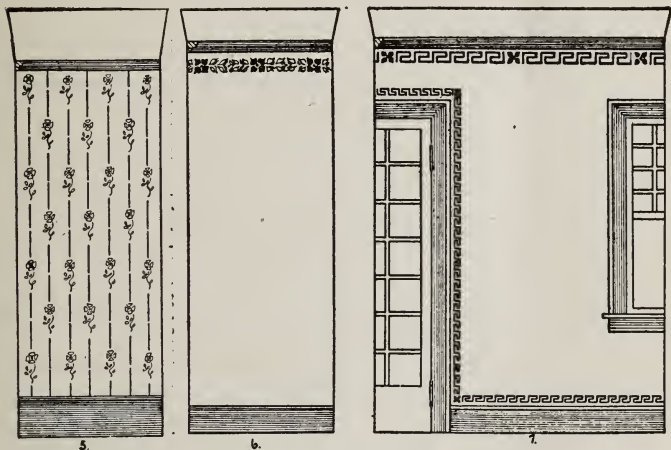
Stencil Treatment for Small Rooms with Low Ceilings.
